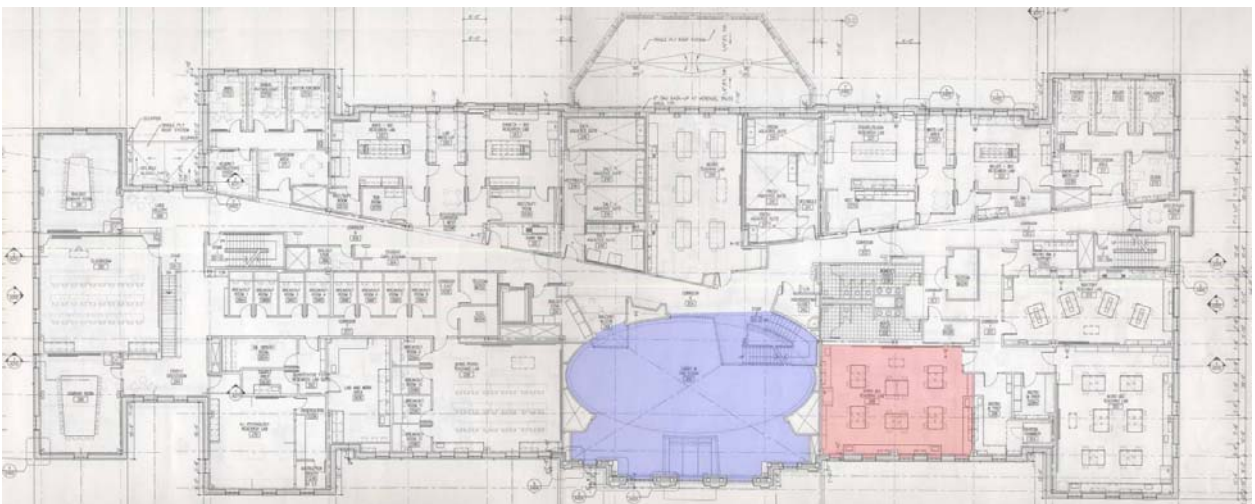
Second Floor Plan – Life Sciences & Philosophy Building
